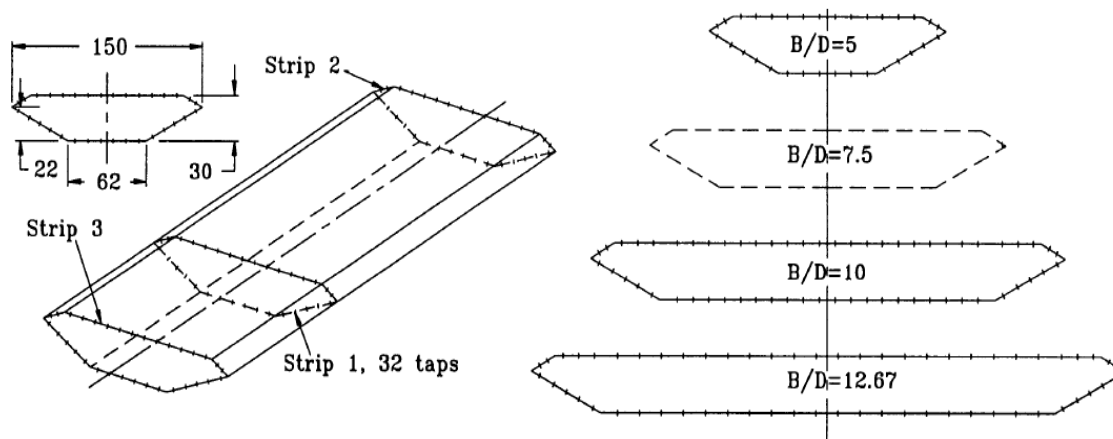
Trapezoidal cross section model of bridge deck with different length to width ratio (5,7.5, 10 and 12.67)
